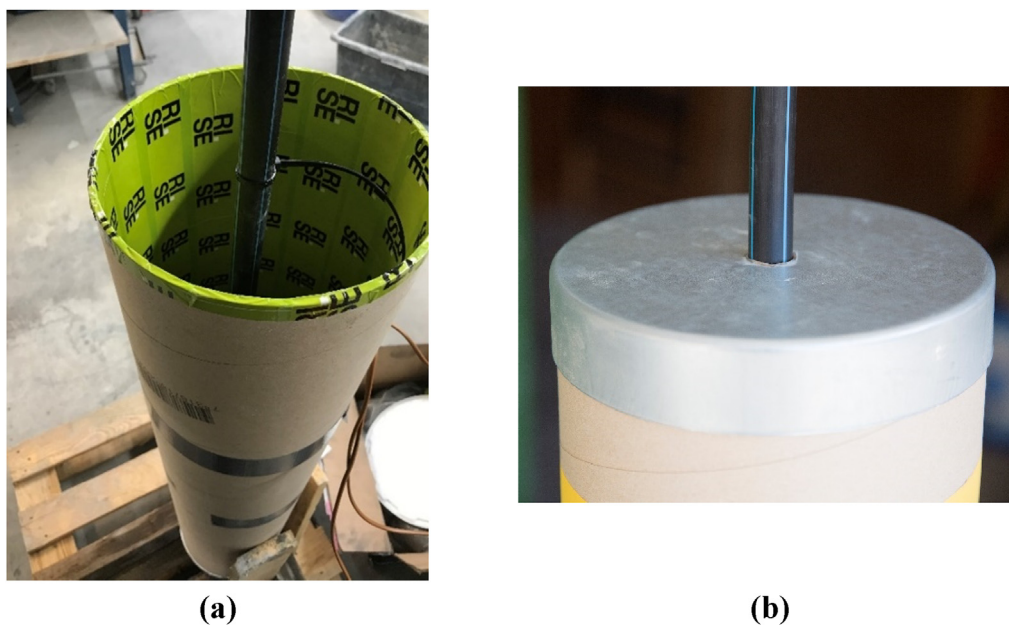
Grout column used in the tests: (a) Cardboard mold fixed on a wooden pallet and the inner mold surface covered by plastic tape, and (b) Metal lid used to center the PE pipe.
